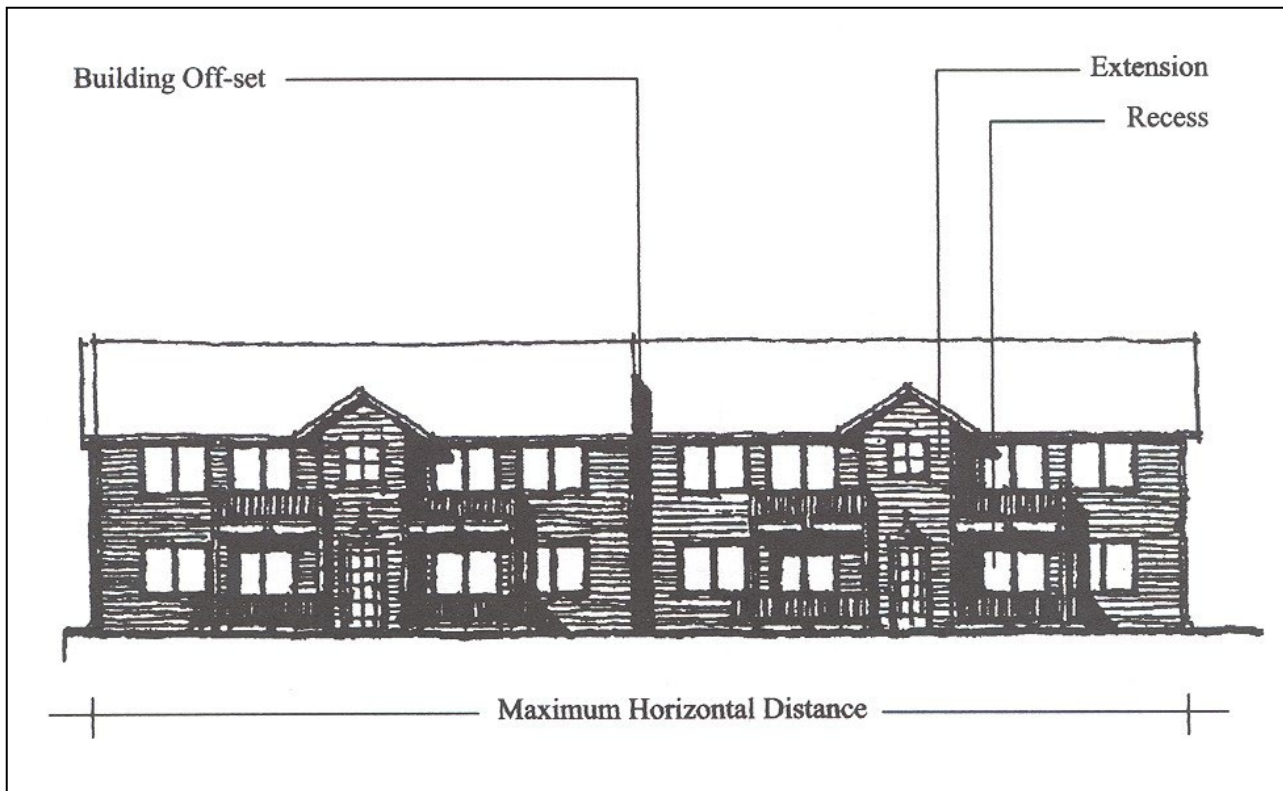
B – Typical Building Orientation – Neighborhood Commercial Building
